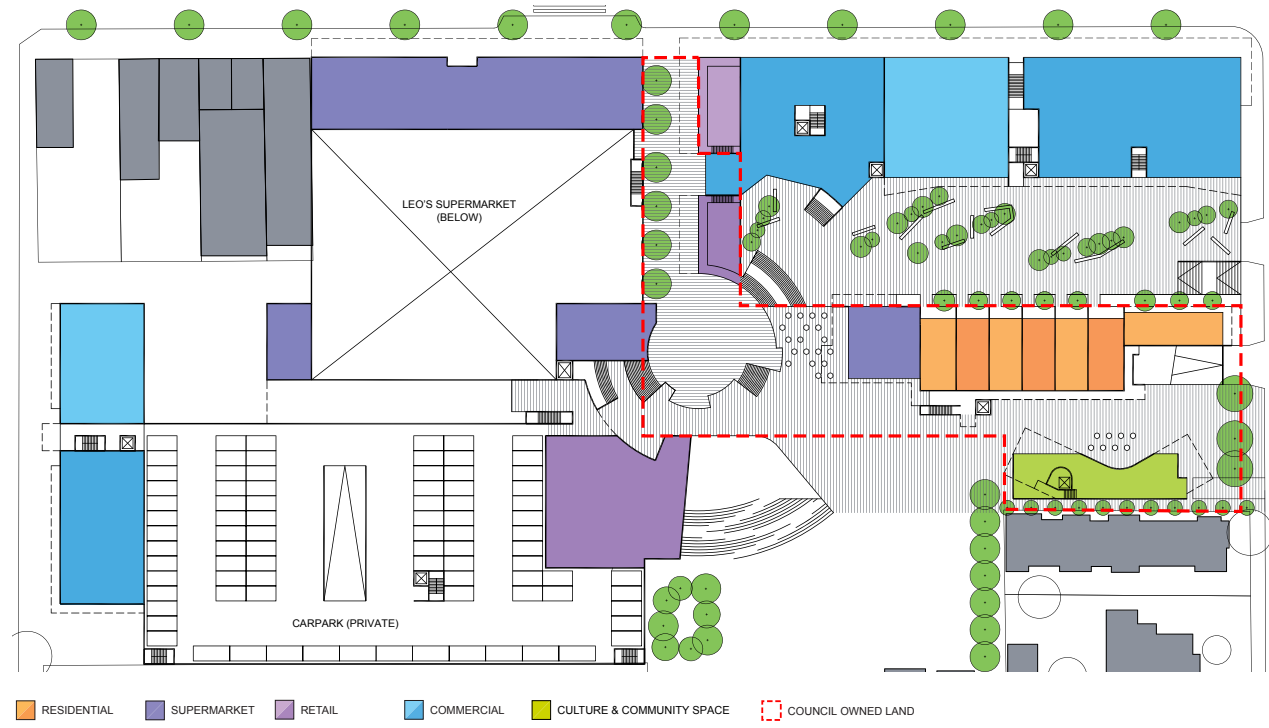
Burgundy Street Site Concept Plan (source: Car Park Sites Study, 2010)
